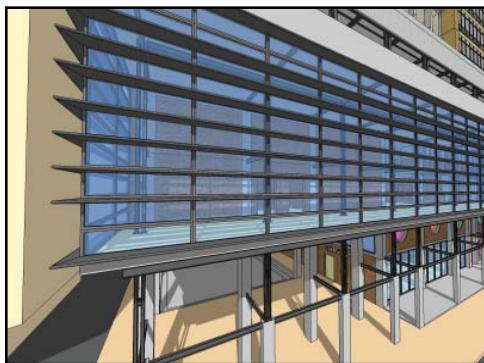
Glazed northern facade with horizontal aluminium extrusions fixed to the structural window frame system
